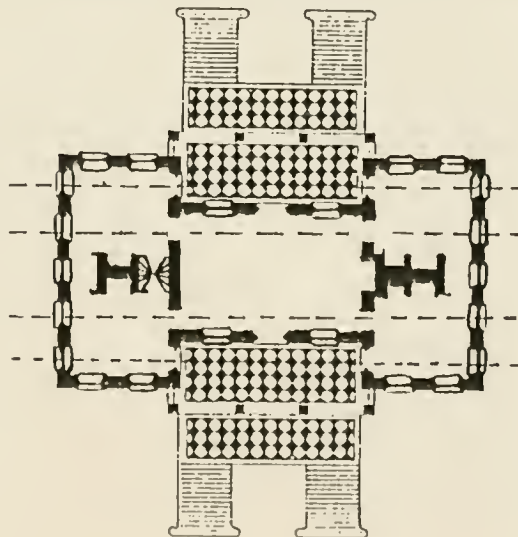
Conjectured original first floor plan of Drayton Hall (RGF after Chase and Murphy)
